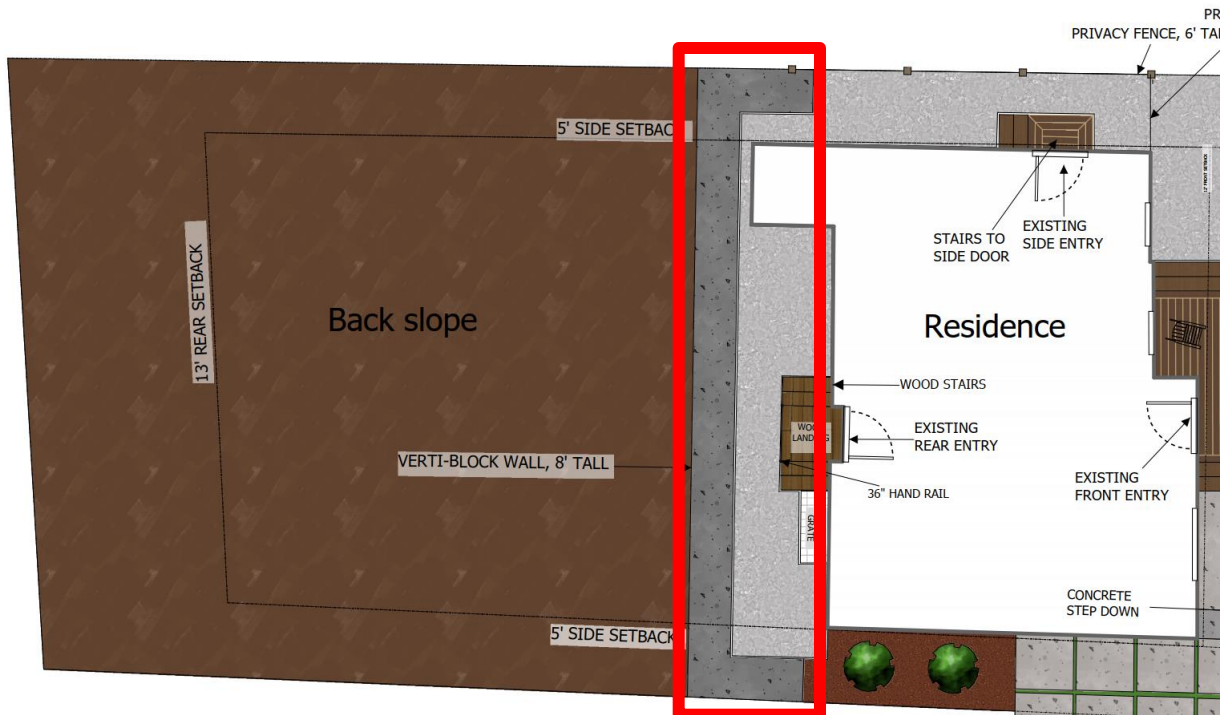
Proposed Retaining Wall in Rear of Property Highlighted in Red
